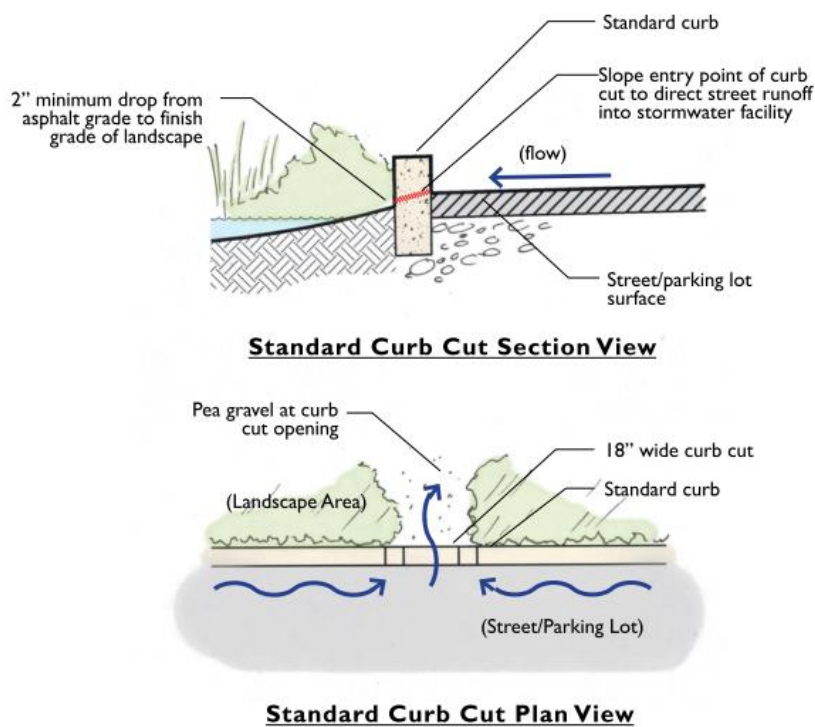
Curb cut section and plan view (San mateo,2009, p130).
